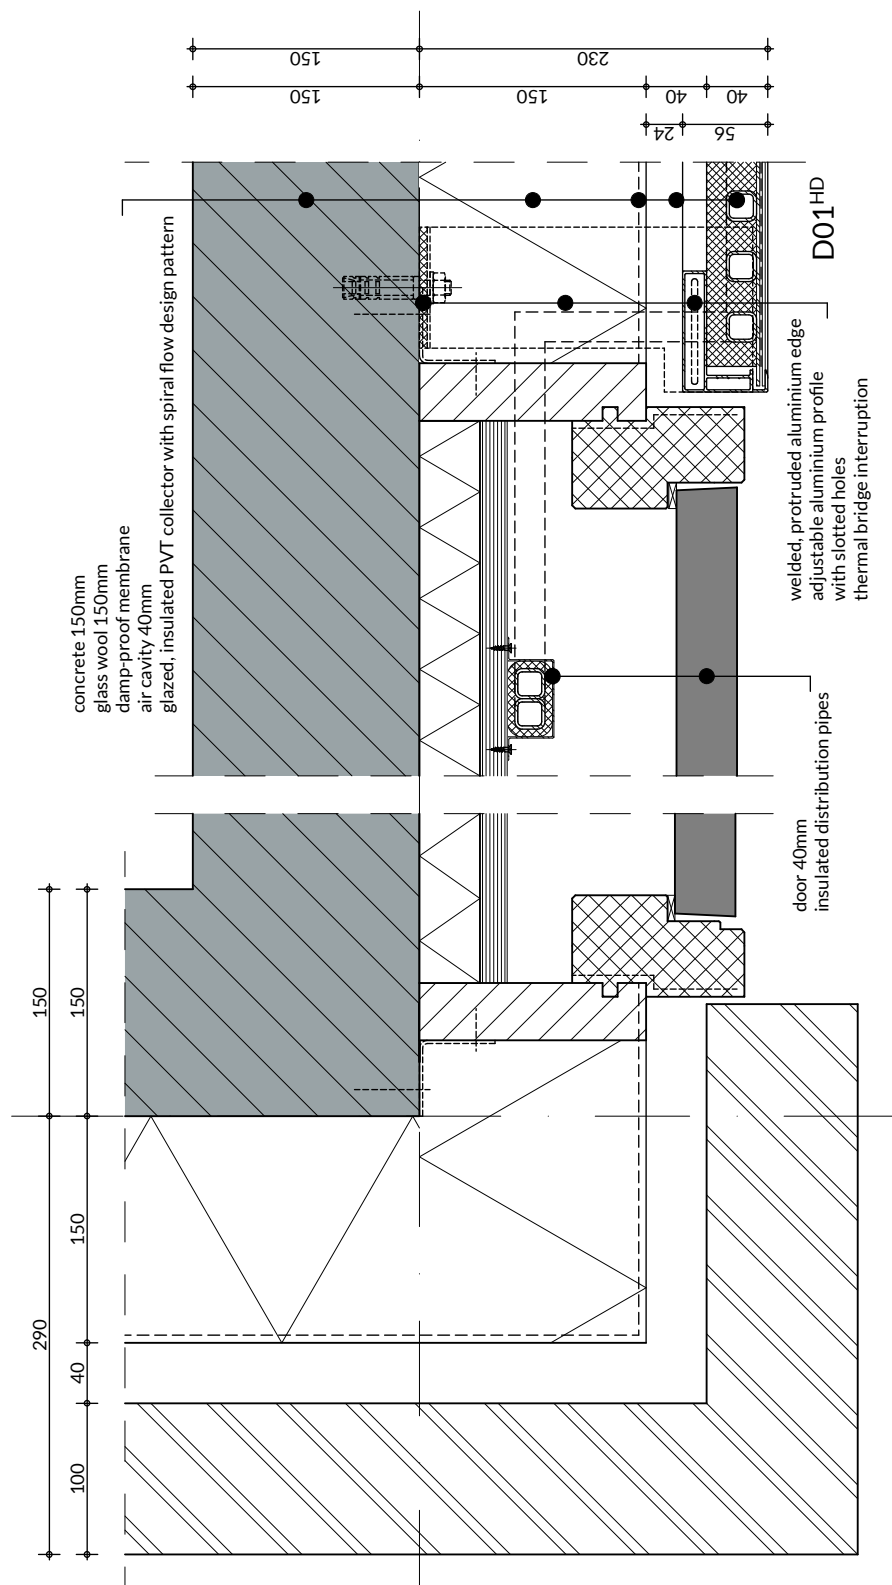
Cavity wall detail D01^{HC}, with the connection between PVT and the distribution pipes (scale 1:5; own illustration).
